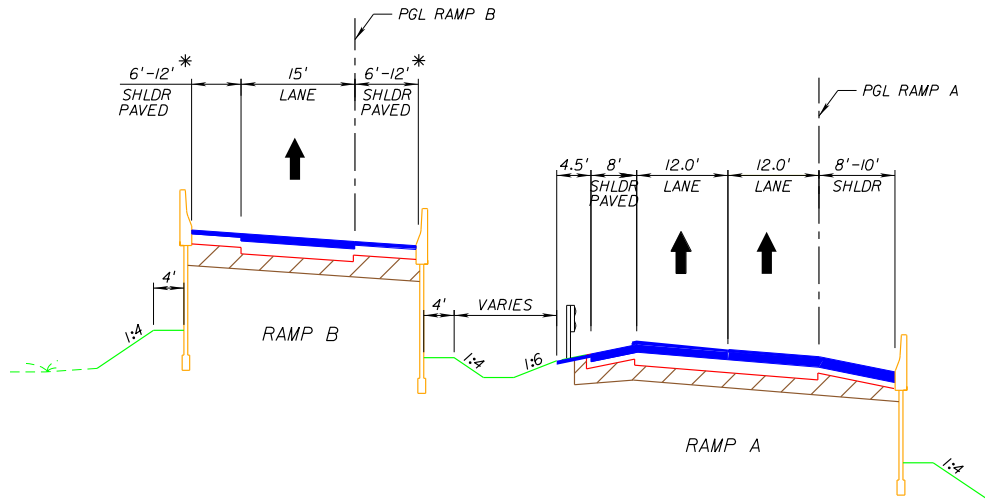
Proposed Typical- SR 826 EB to I-95 NB & SB Ramp- Alt. 3A, 3B & 3C
